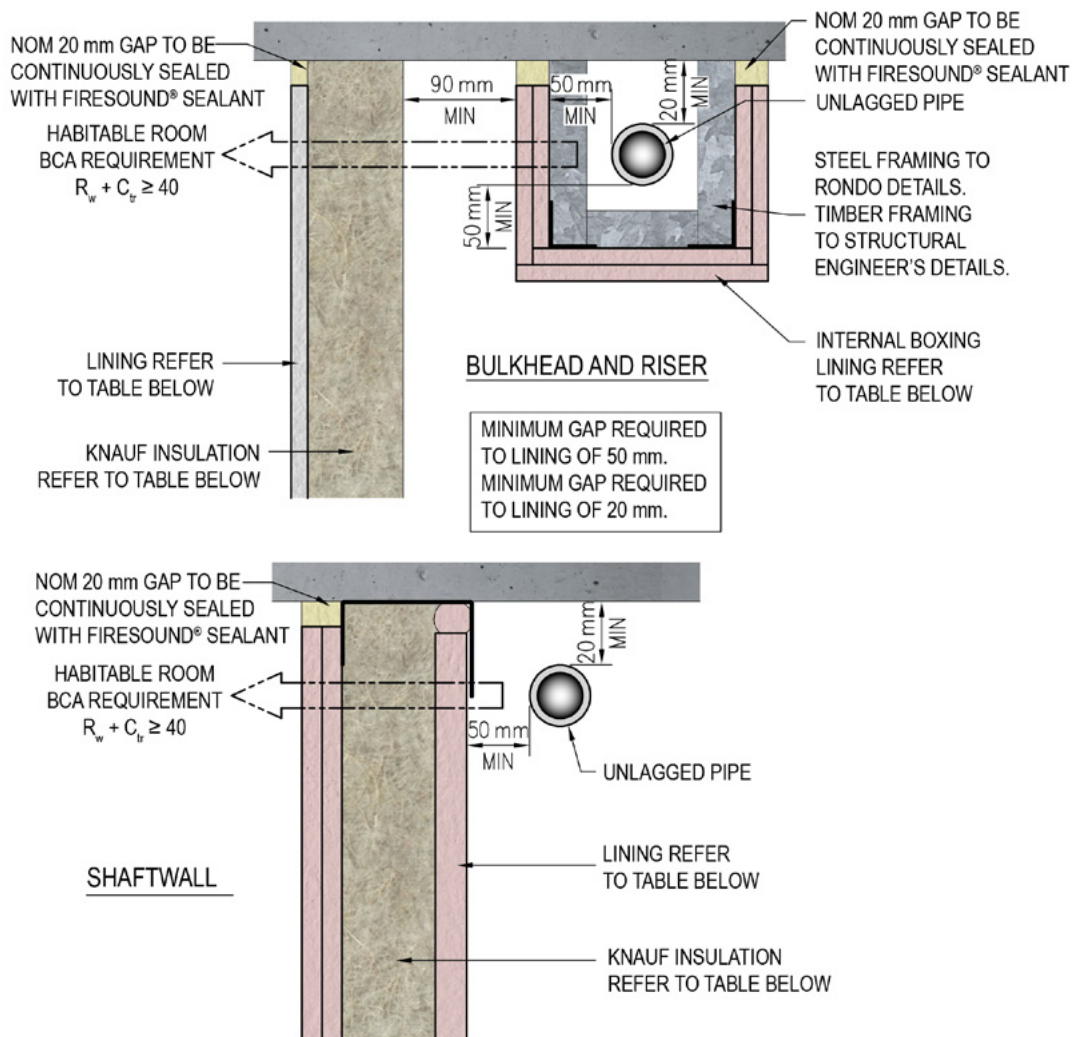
Soil & Waste Pipe Systems - $R_w + C_{tr}$ 40 (No Lagging) Wall Systems
